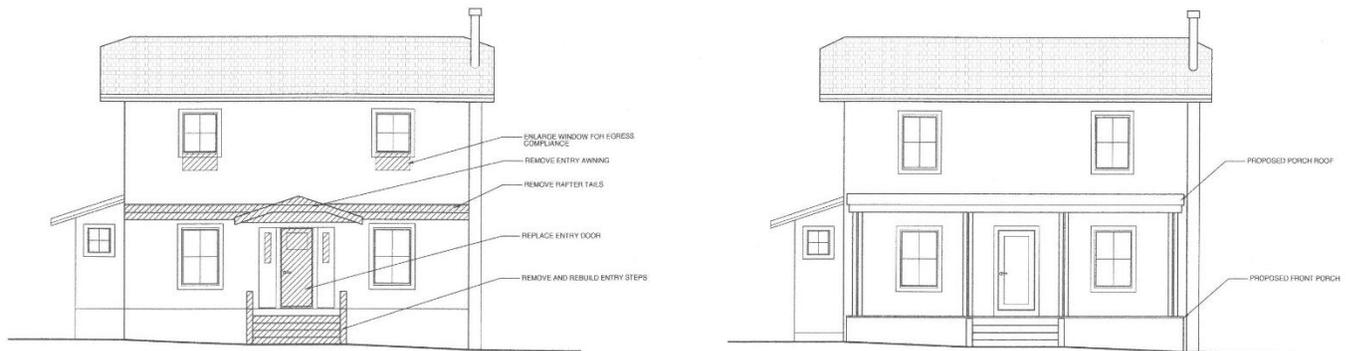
Existing (left) and Proposed North Elevations, 870 University Ave. Shaded area on existing drawing shows scope of demolition.
